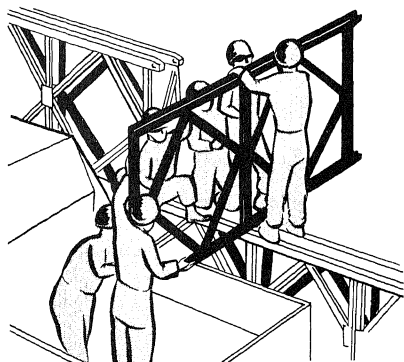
Adding second-story panels, using truck as working platform—lifting panel.
